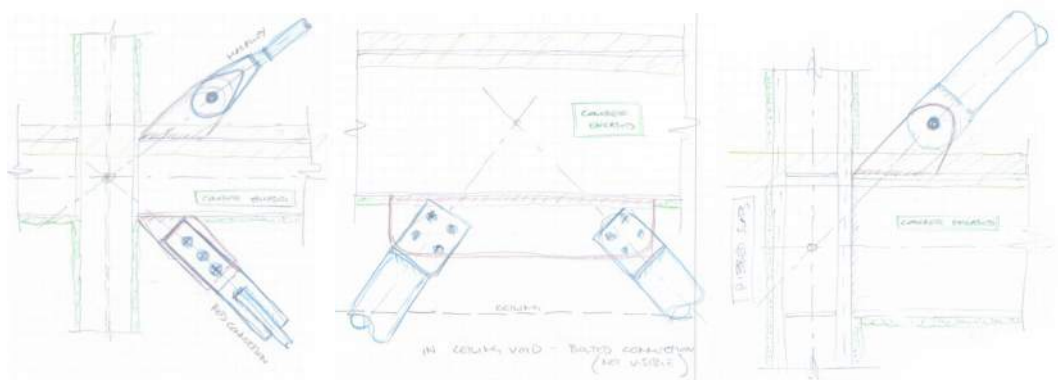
Options for struts and cross-bracing with cleats welded to existing steel frame
